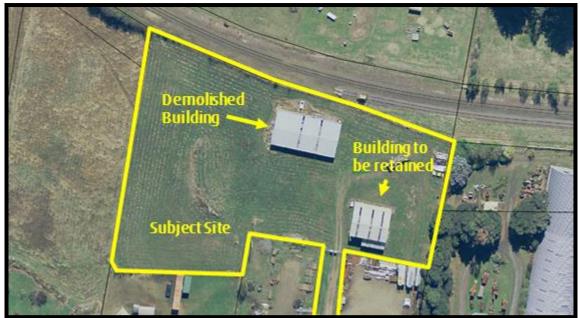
aerial photo showing the building that has been demolished and the building to be retained.
